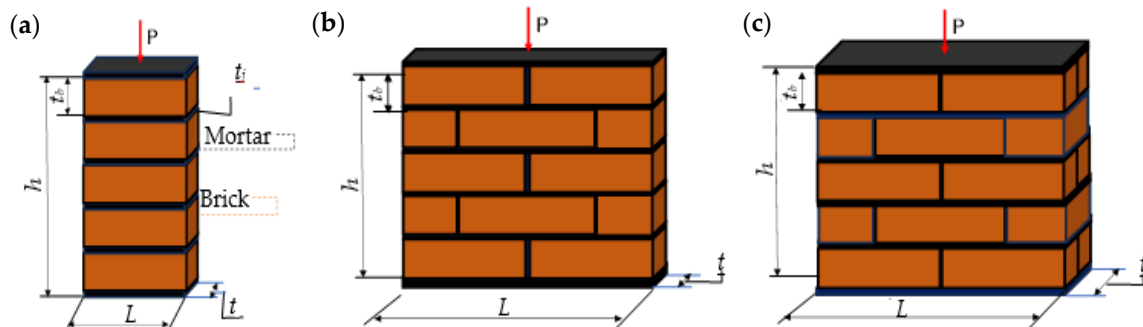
Types of masonry specimens: (a) prism, (b) panel-shaped wallet, and (c) block-shaped wallet.
